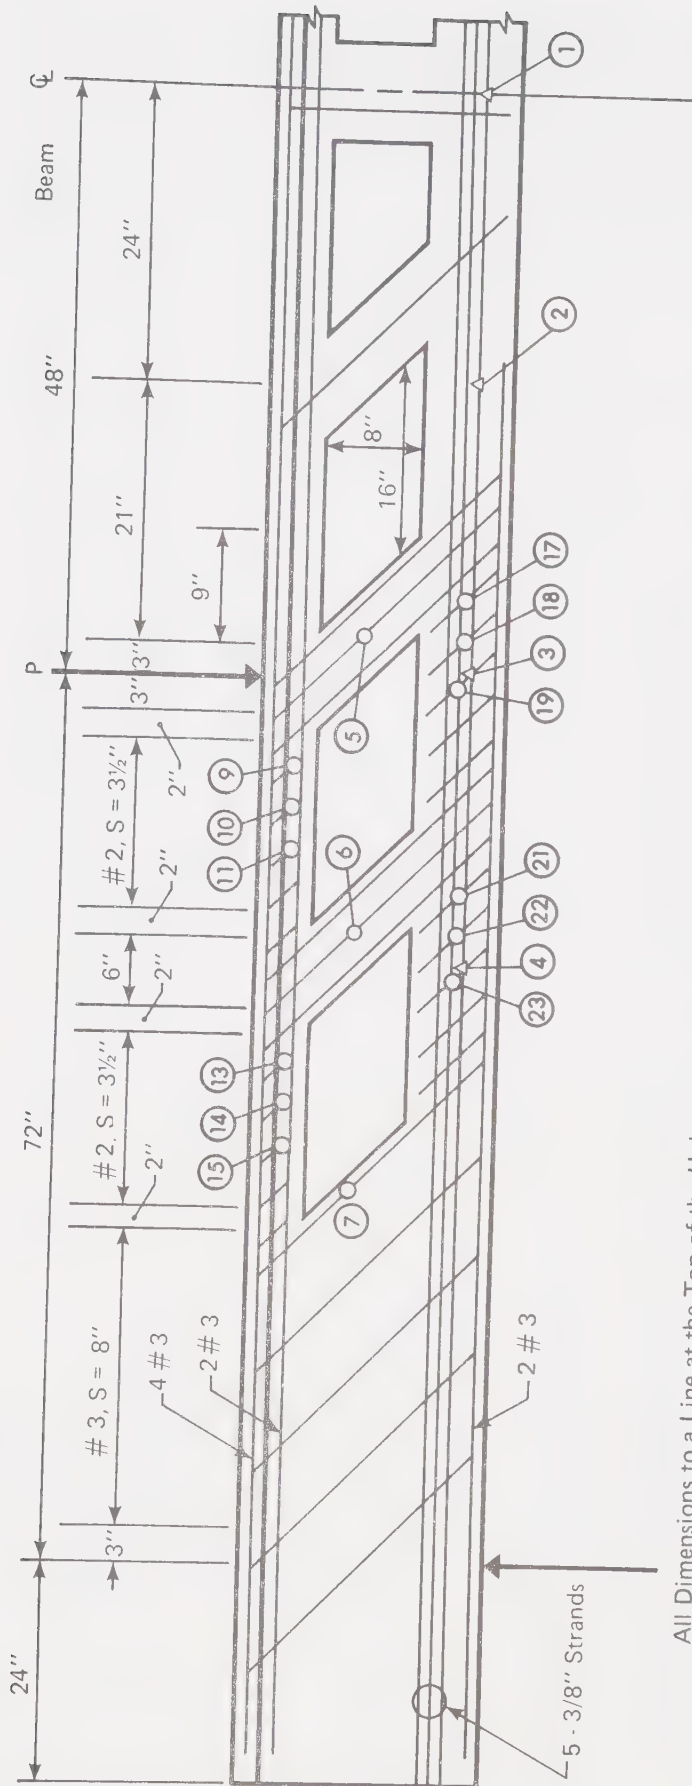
Reinforcement Details and Strain Gage Locations for Beam 12-16-6-P
